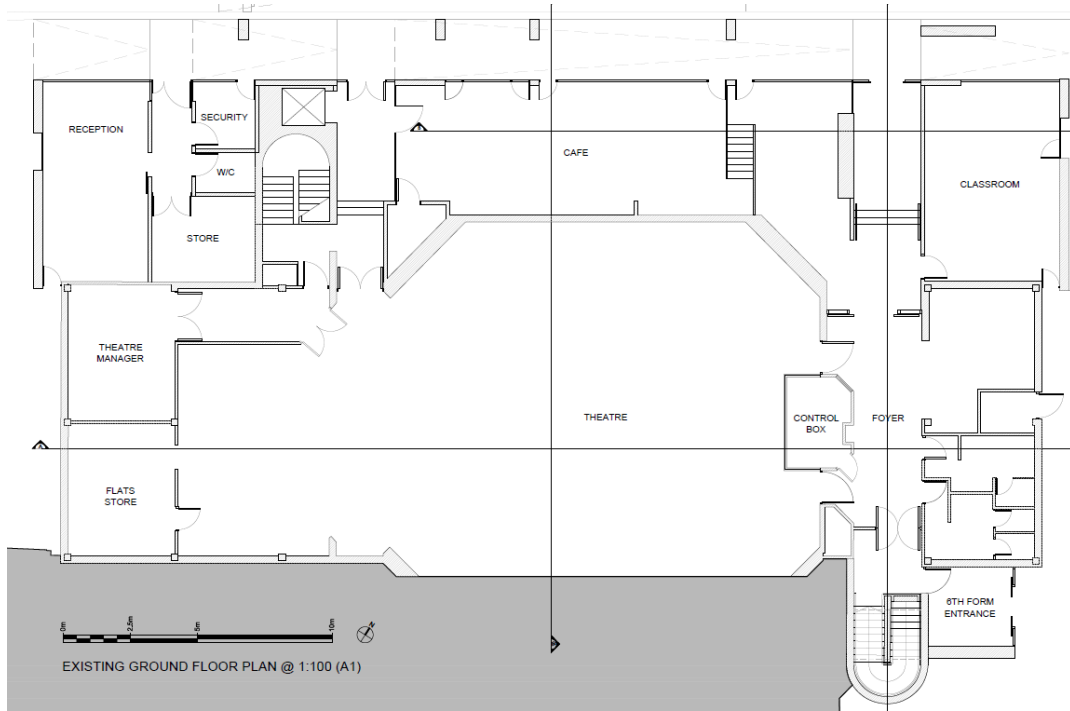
Existing Ground Floor Plan of Sixth Form Centre -2010 colonnaded extension at top
